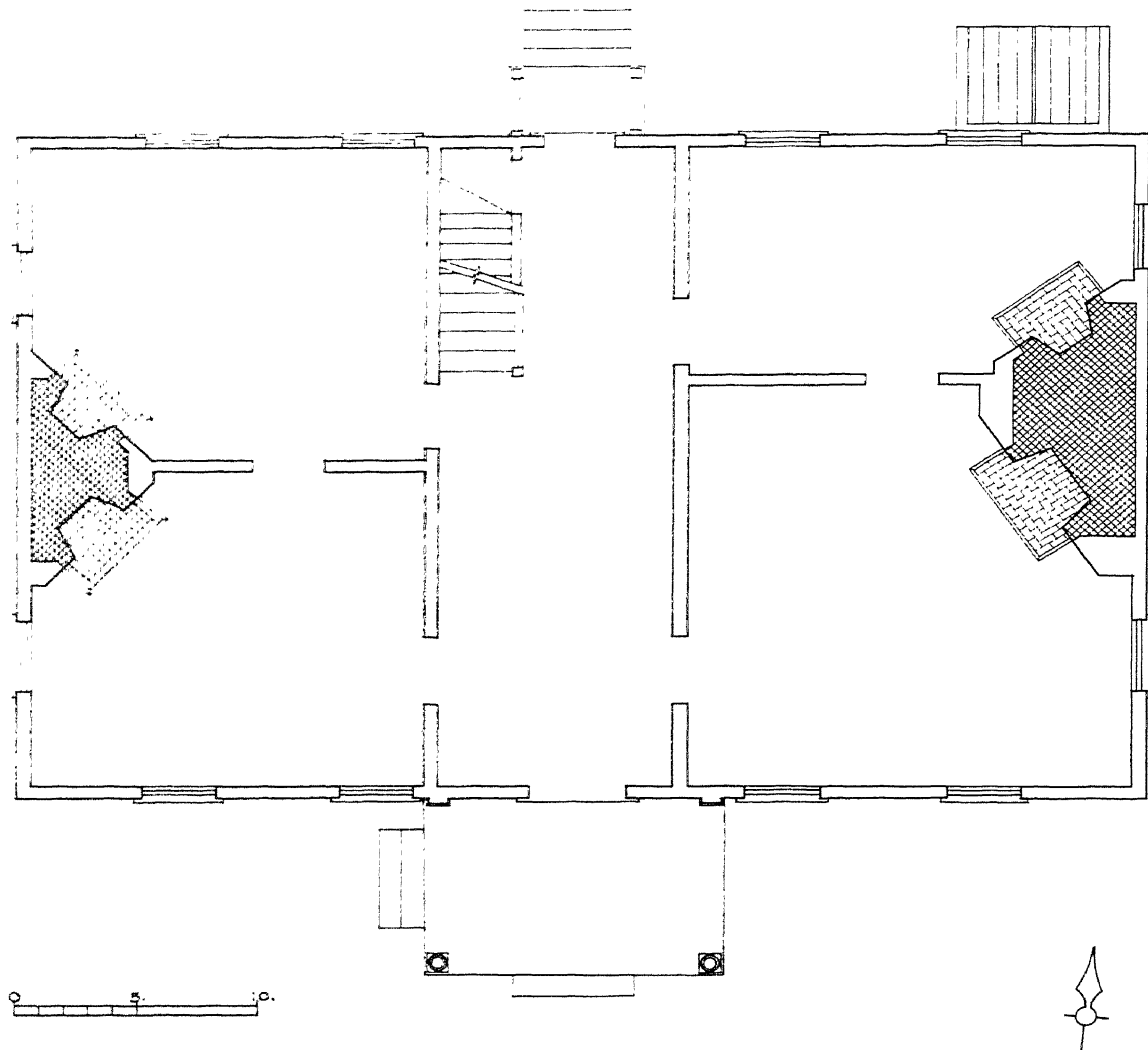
THE ARCHIBALD BLAIR HOUSE. Plan.
